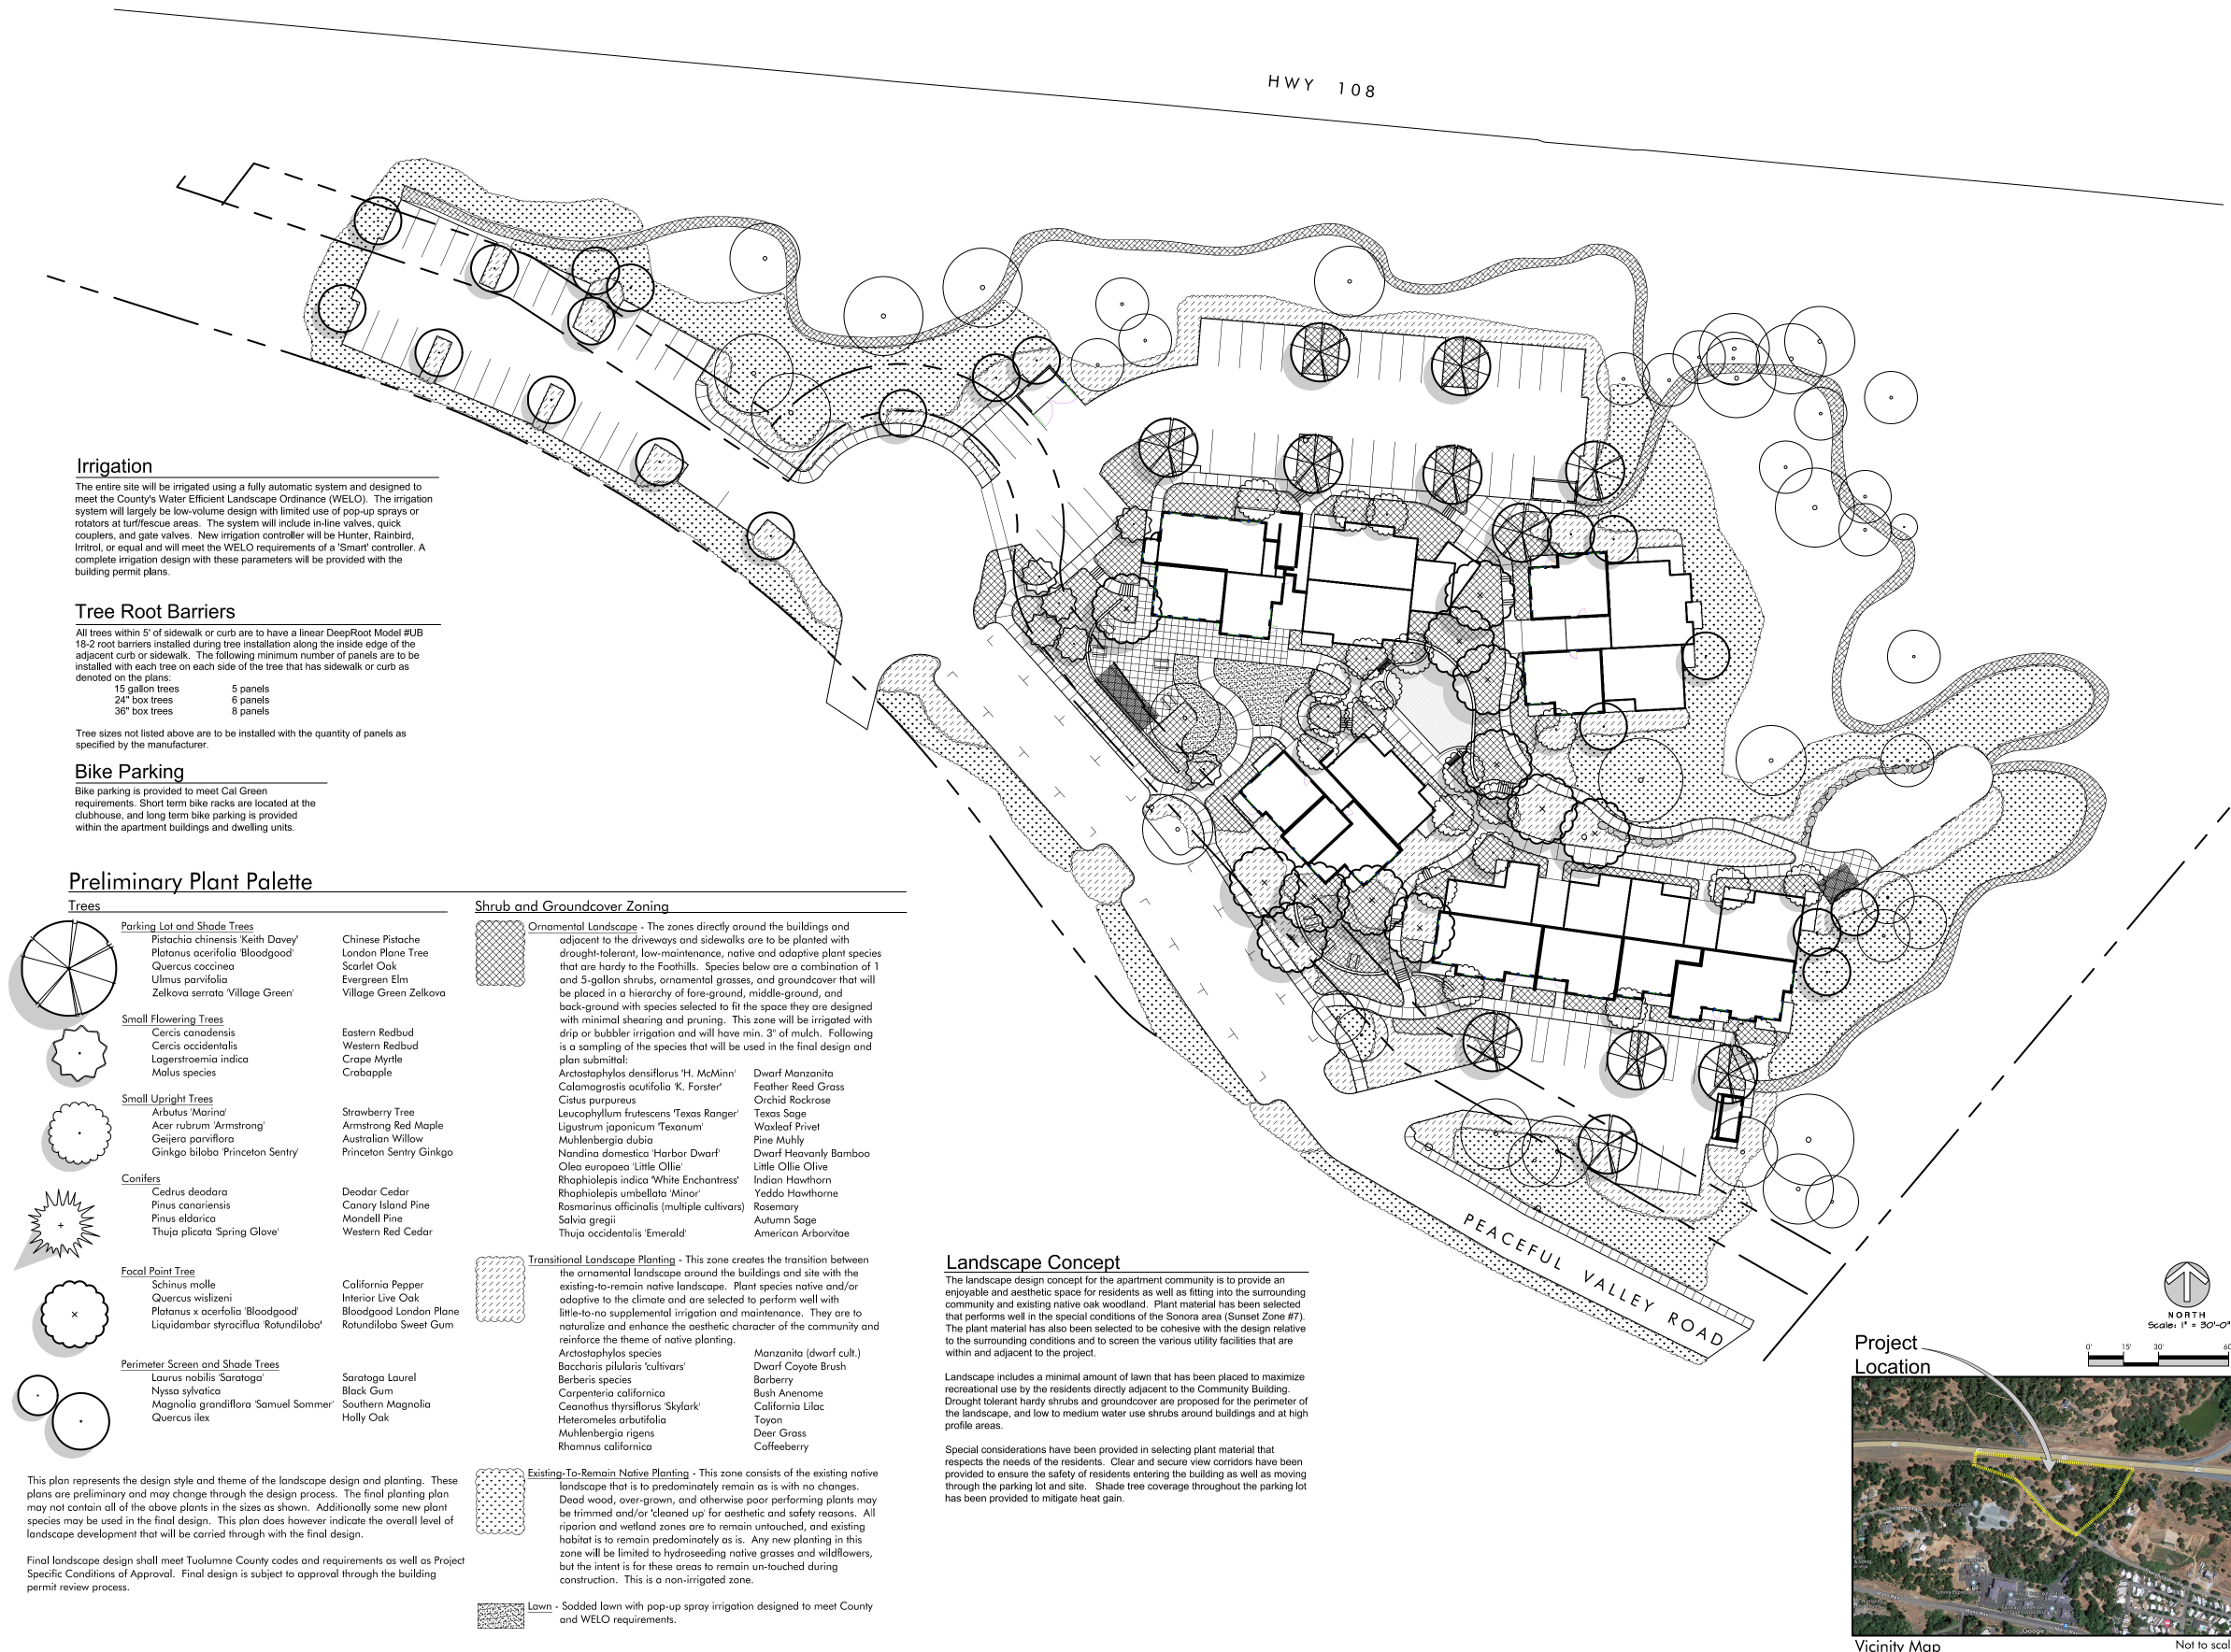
PRELIMINARY LANDSCAPING PLAN
